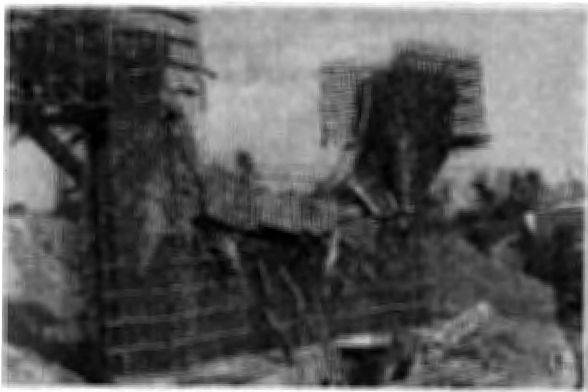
State of the collapsed form shoring at the construction site of Honsyu-Shikoku bridge.
